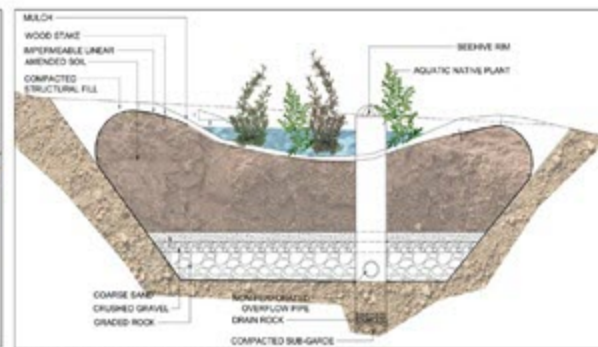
BIOSWALE TYPICAL DETAIL
